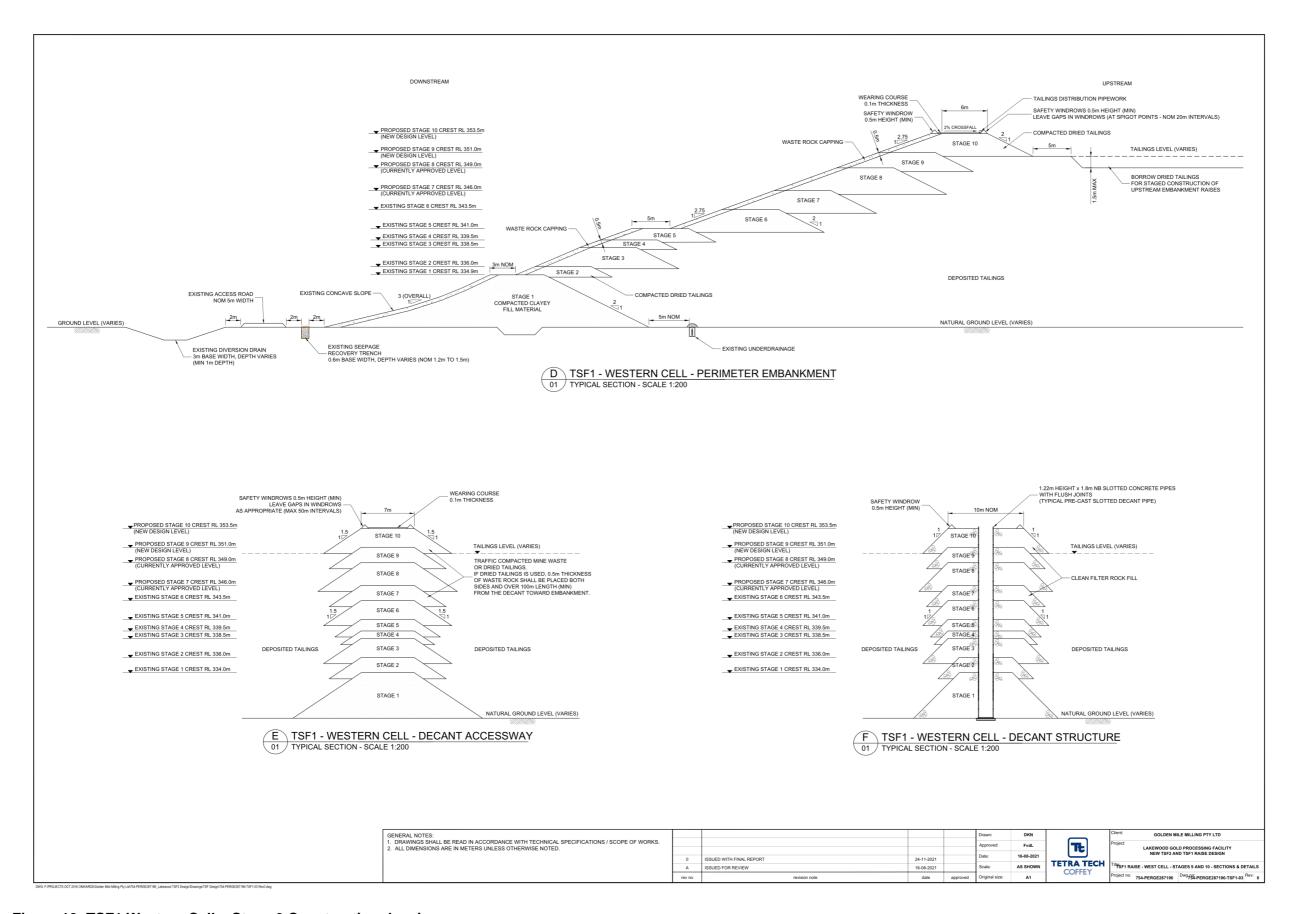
TSF1 Western Cell – Stage 9 Construction drawings
